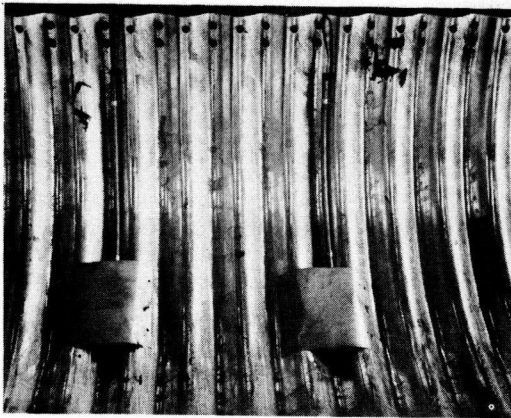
Gages installed on culvert plate (Ring 31, Bottom) and covered with metal plate for mechanical protection.
